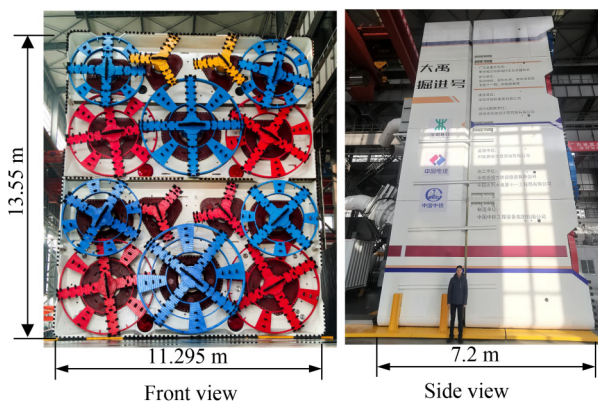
“Dayu”—The large cross-section modular rectangular pipe jacking machine.
